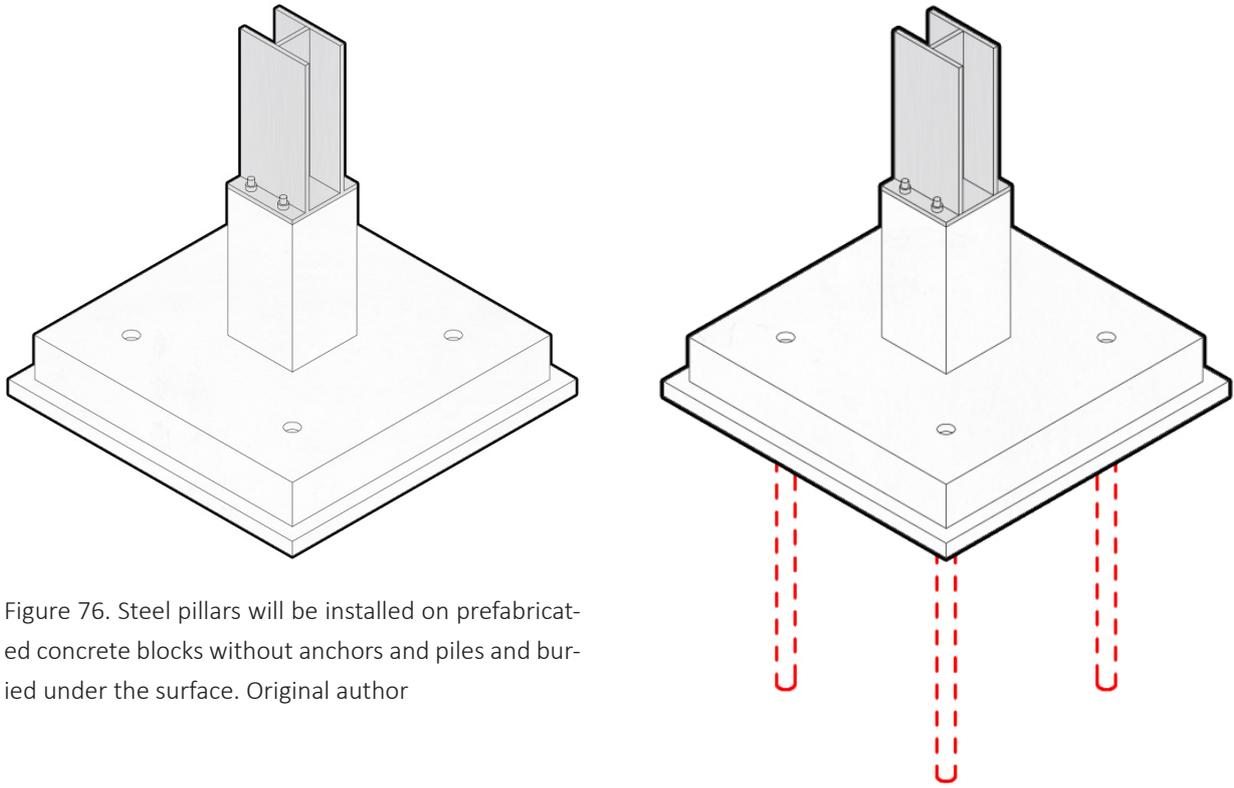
Steel pillars will be installed on prefabricated concrete blocks without anchors and piles and buried under the surface. Original author
